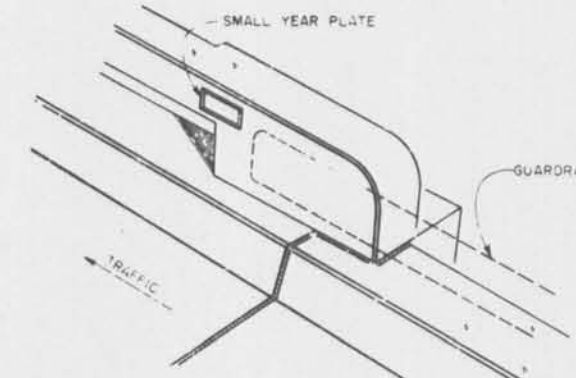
PLATE LOCATIONS FOR TWIN BRIDGE SITES
